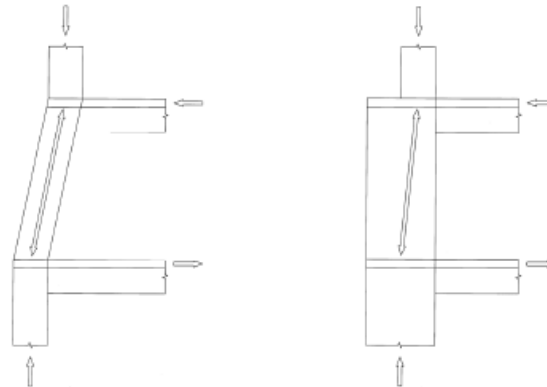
Diaphragm forces due to sloped column (Scarry, 2014) [21]
